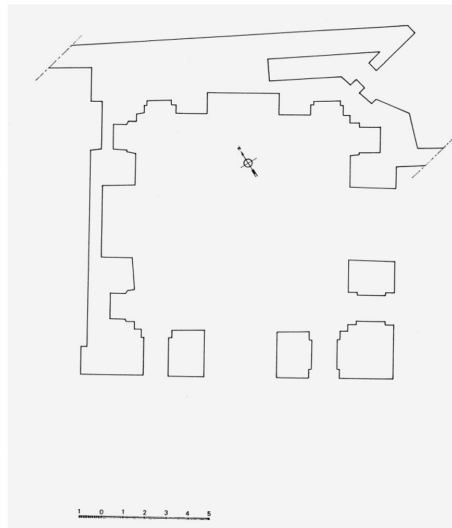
Plan of north dome (photogrammetric view; after Laleh).
